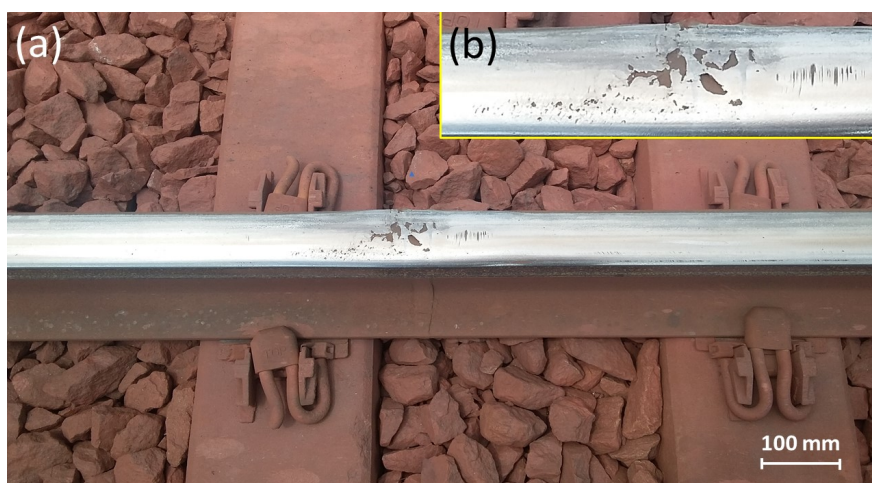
(a) Rail joint defect on flash butt welded rail after installation on track and load applied to welded joint; (b) detail of rail welding surface defect.
